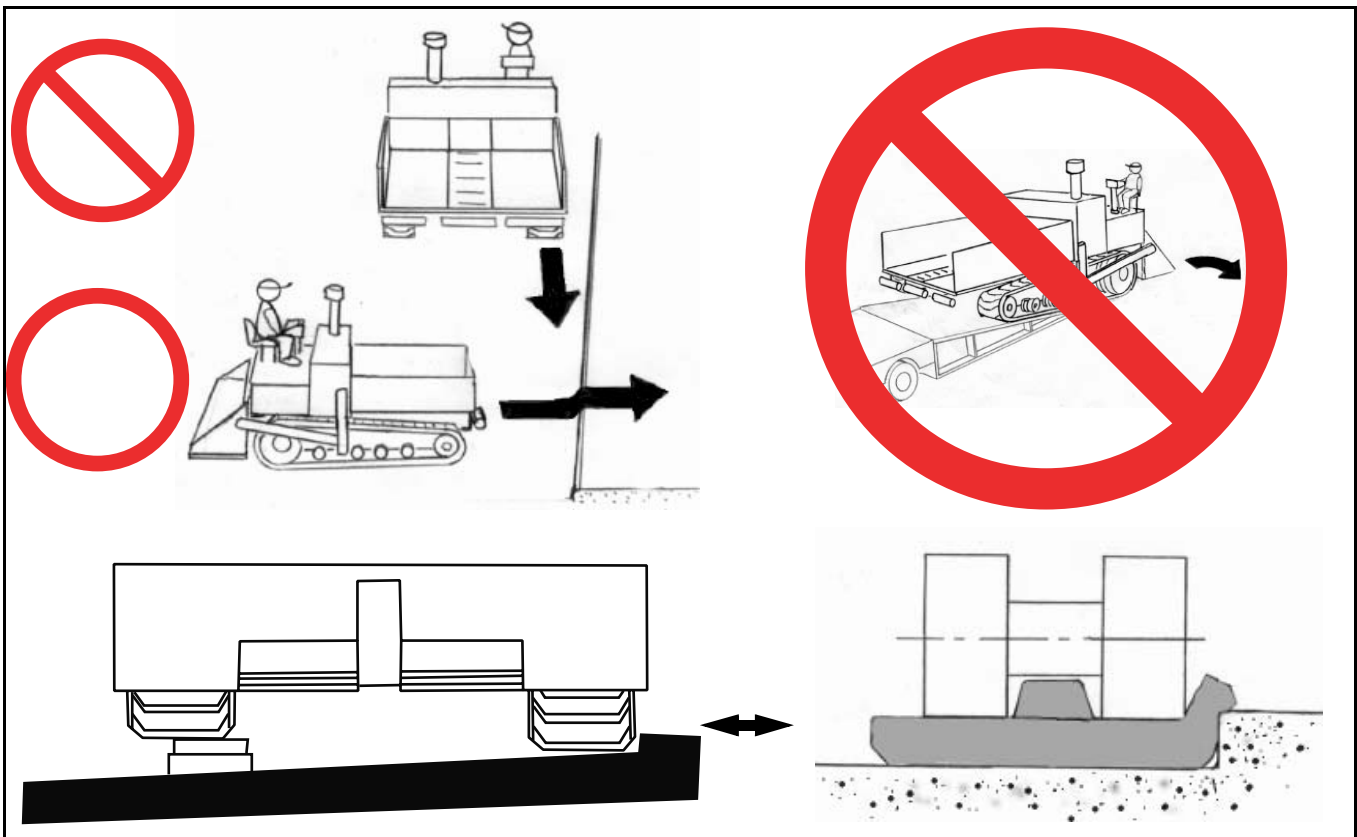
49 Steps in Elevation & Uneven Surfaces
